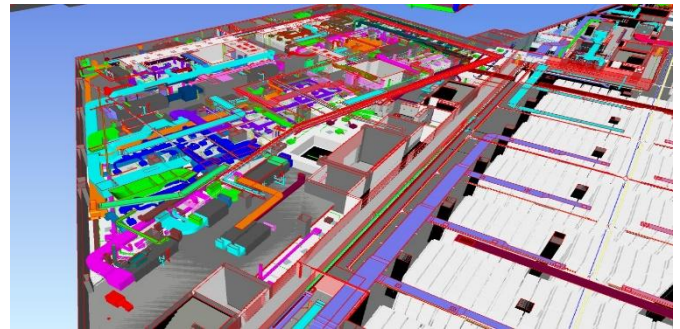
3D model of a floor plan of Phase 2 sample project.
